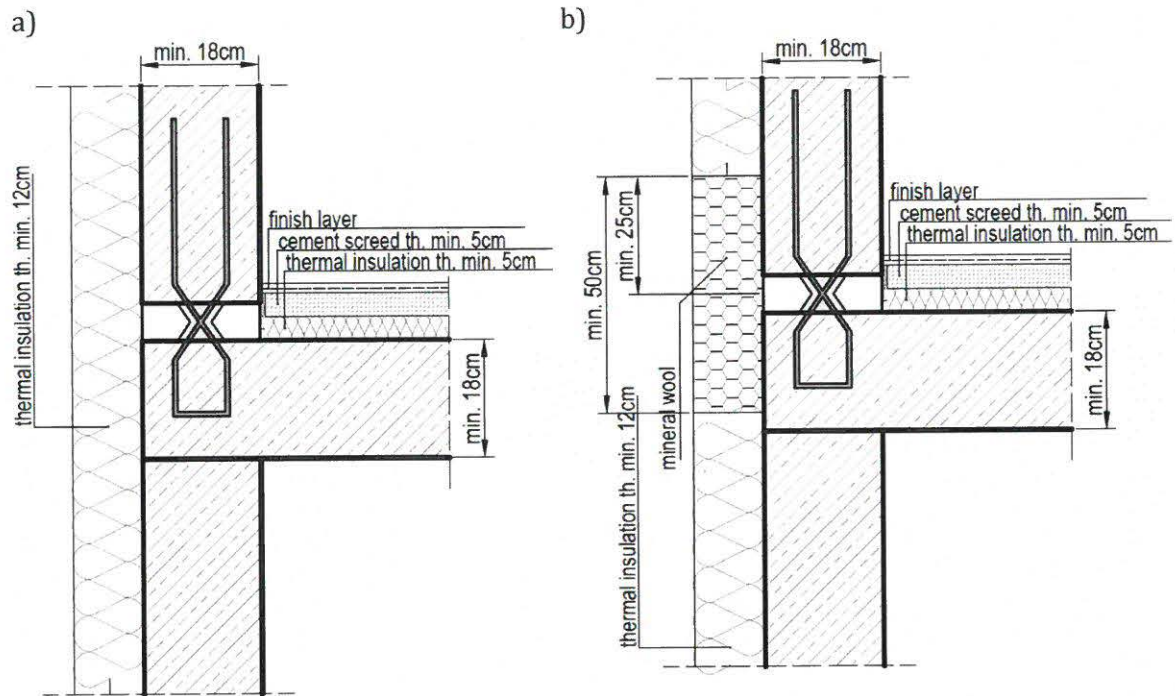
External wall and floor connection with Schöck Alphadock / Sconnex Typ W
